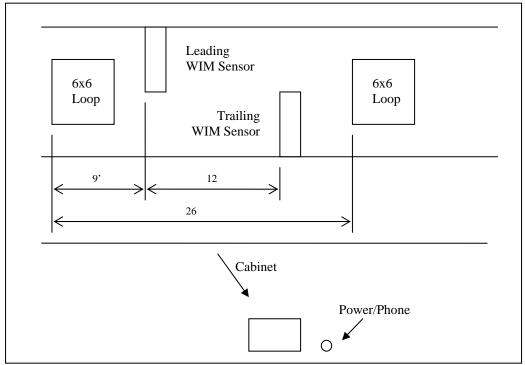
Site Equipment Layout for 510100 in Virginia
